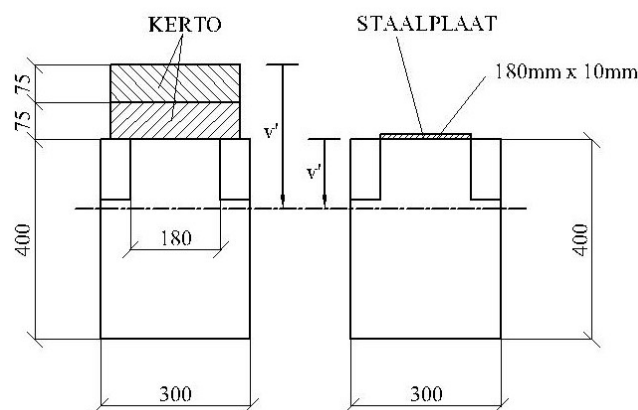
Reinforcement of the top of a beam using LVL (left) and steel (right) [8]
